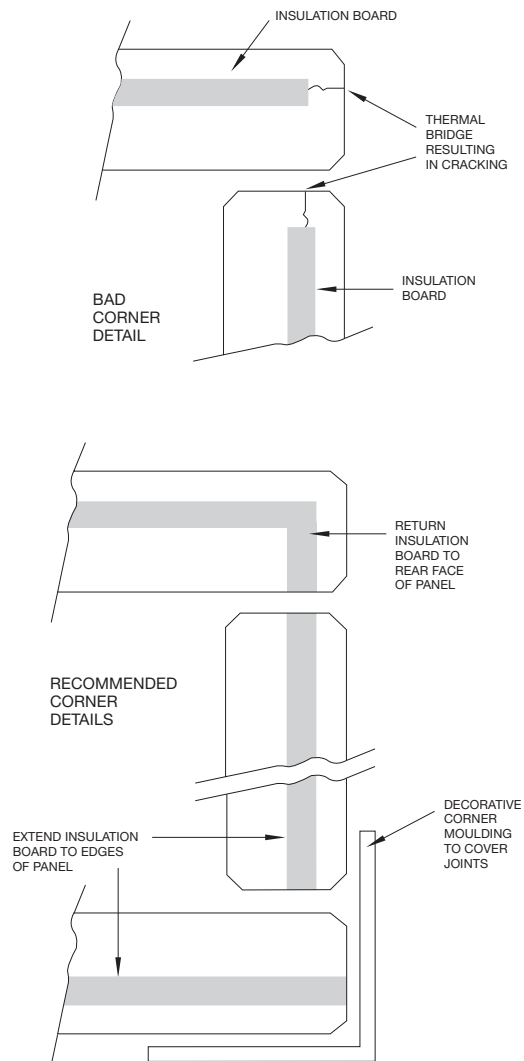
Concrete Sandwich Panel Corner Jointing Details
